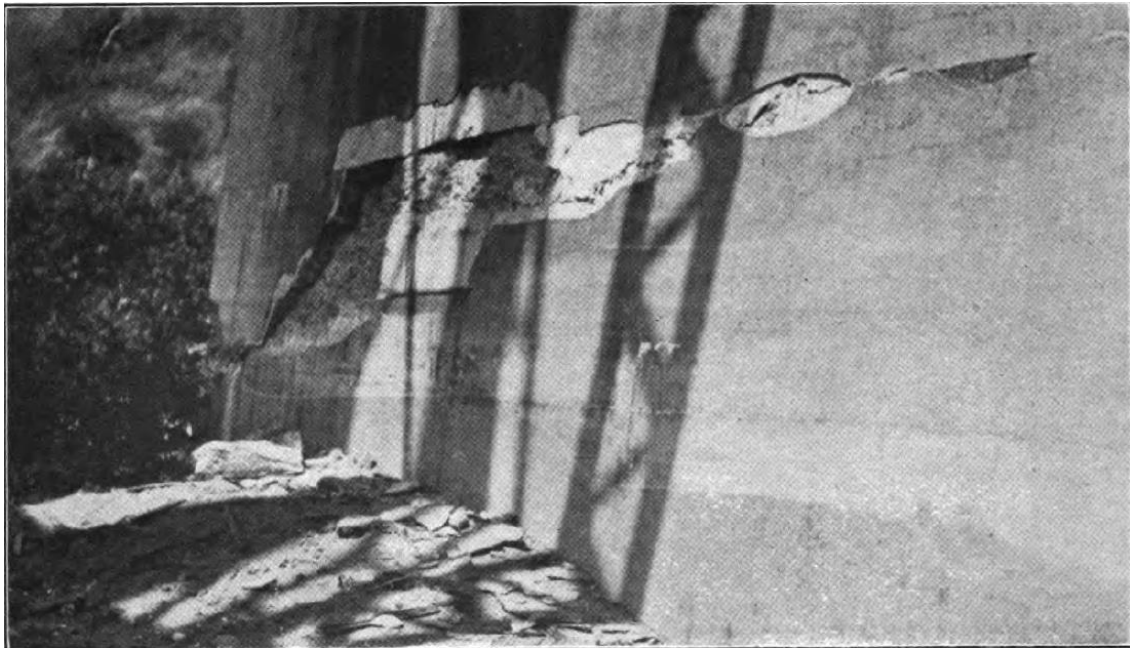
Cracking Damage at the Base of a URC Pier of Pajaro Bridge after 1906 San Francisco Earthquake (Duryea and ASCE 1907)
